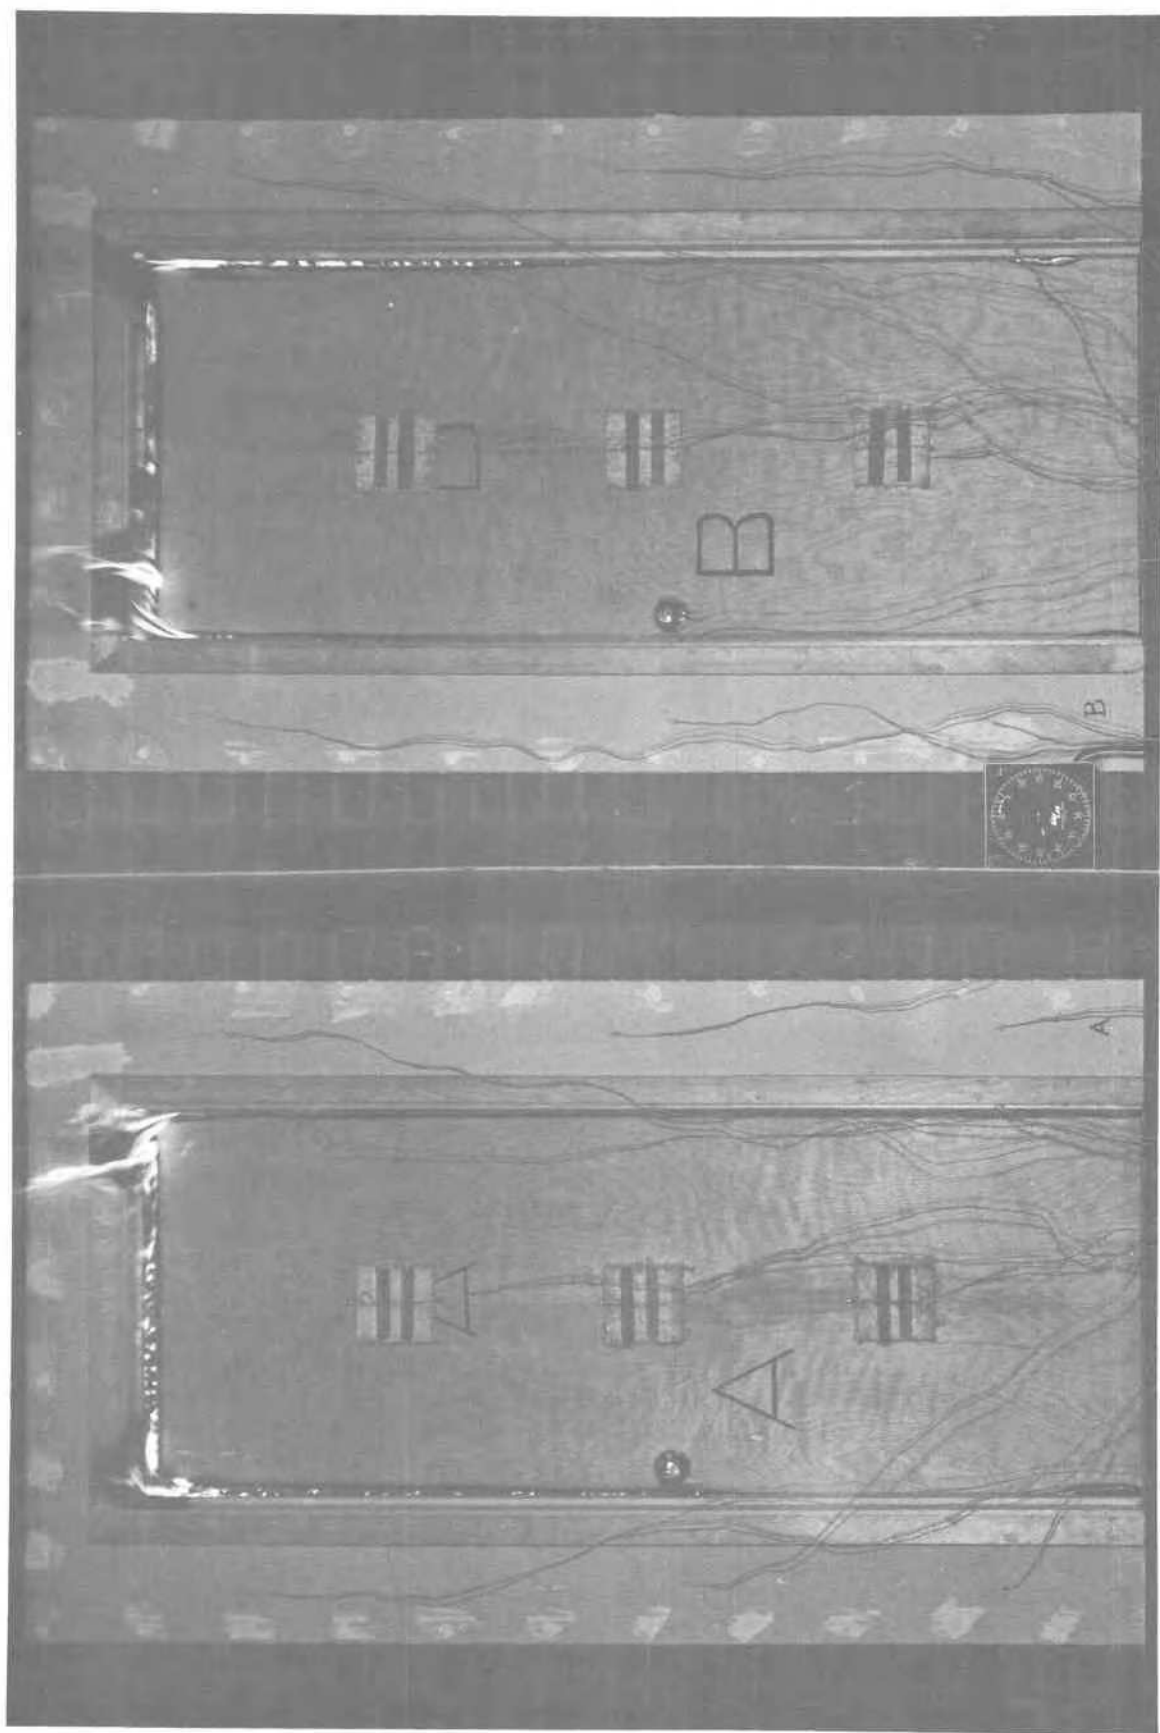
Door Test No. 1. Unexposed face at 16 min.
